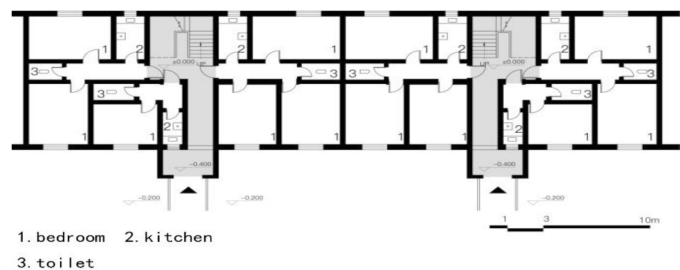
Floor plan of a two-story Western house (drawn by the author according to the actual survey).
